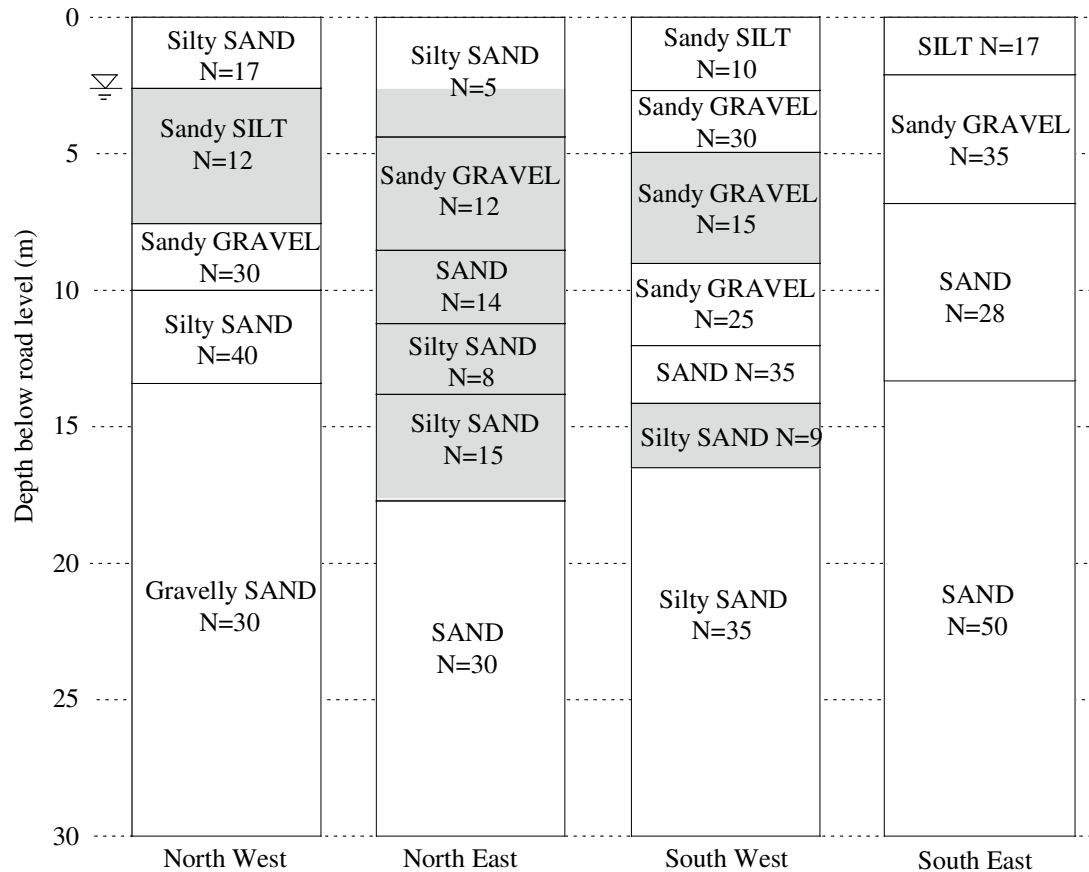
Summarised soil profiles and assumed SPT blow counts for locations at the four corners of the bridge. The shaded areas indicate soil layers deemed to be liquefiable.
